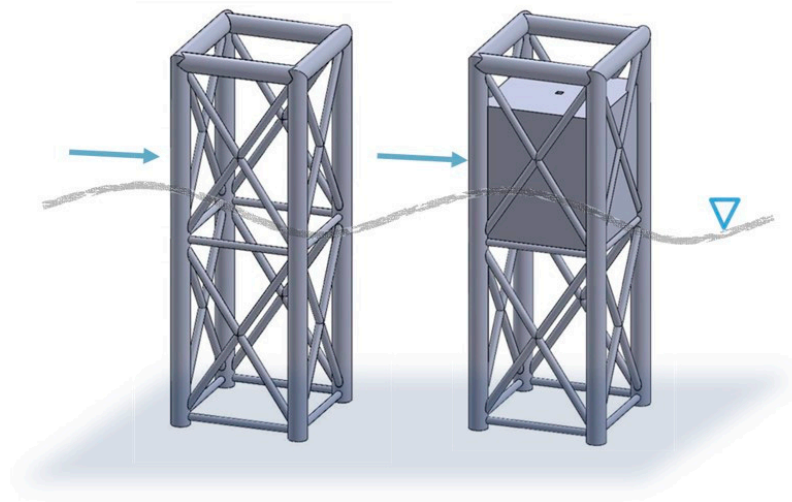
Schematic drawing of a jacket type structure installed with OWC converter.
